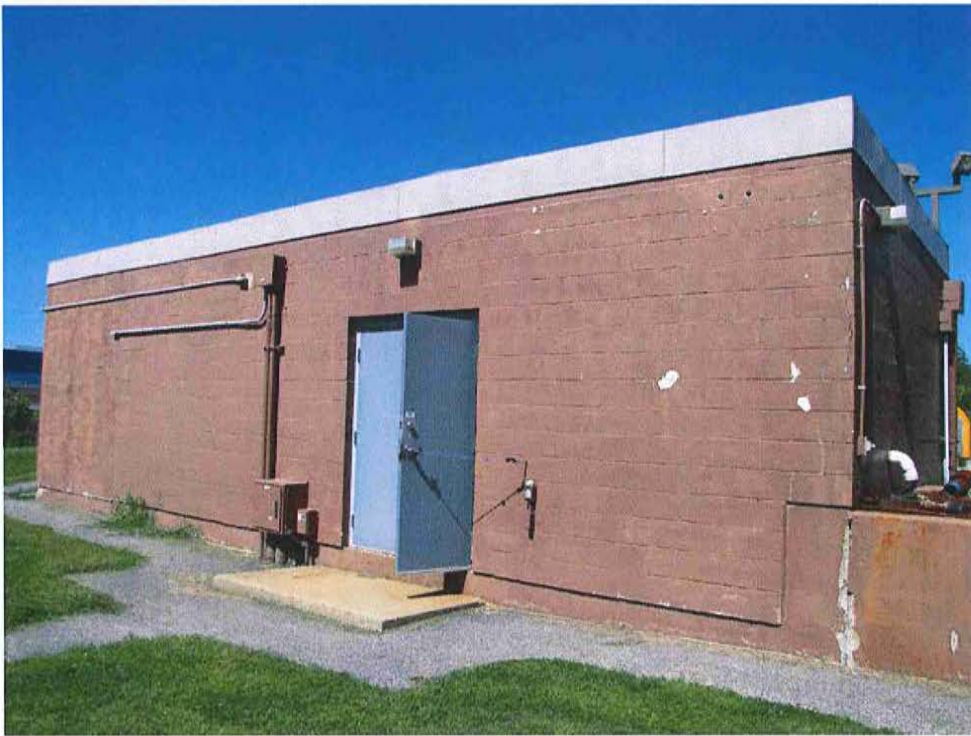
Intermediate Pump Station - View of south wall, with some paint degradation visible. Front right wall corner is cracked and in need of replacement and repair.
